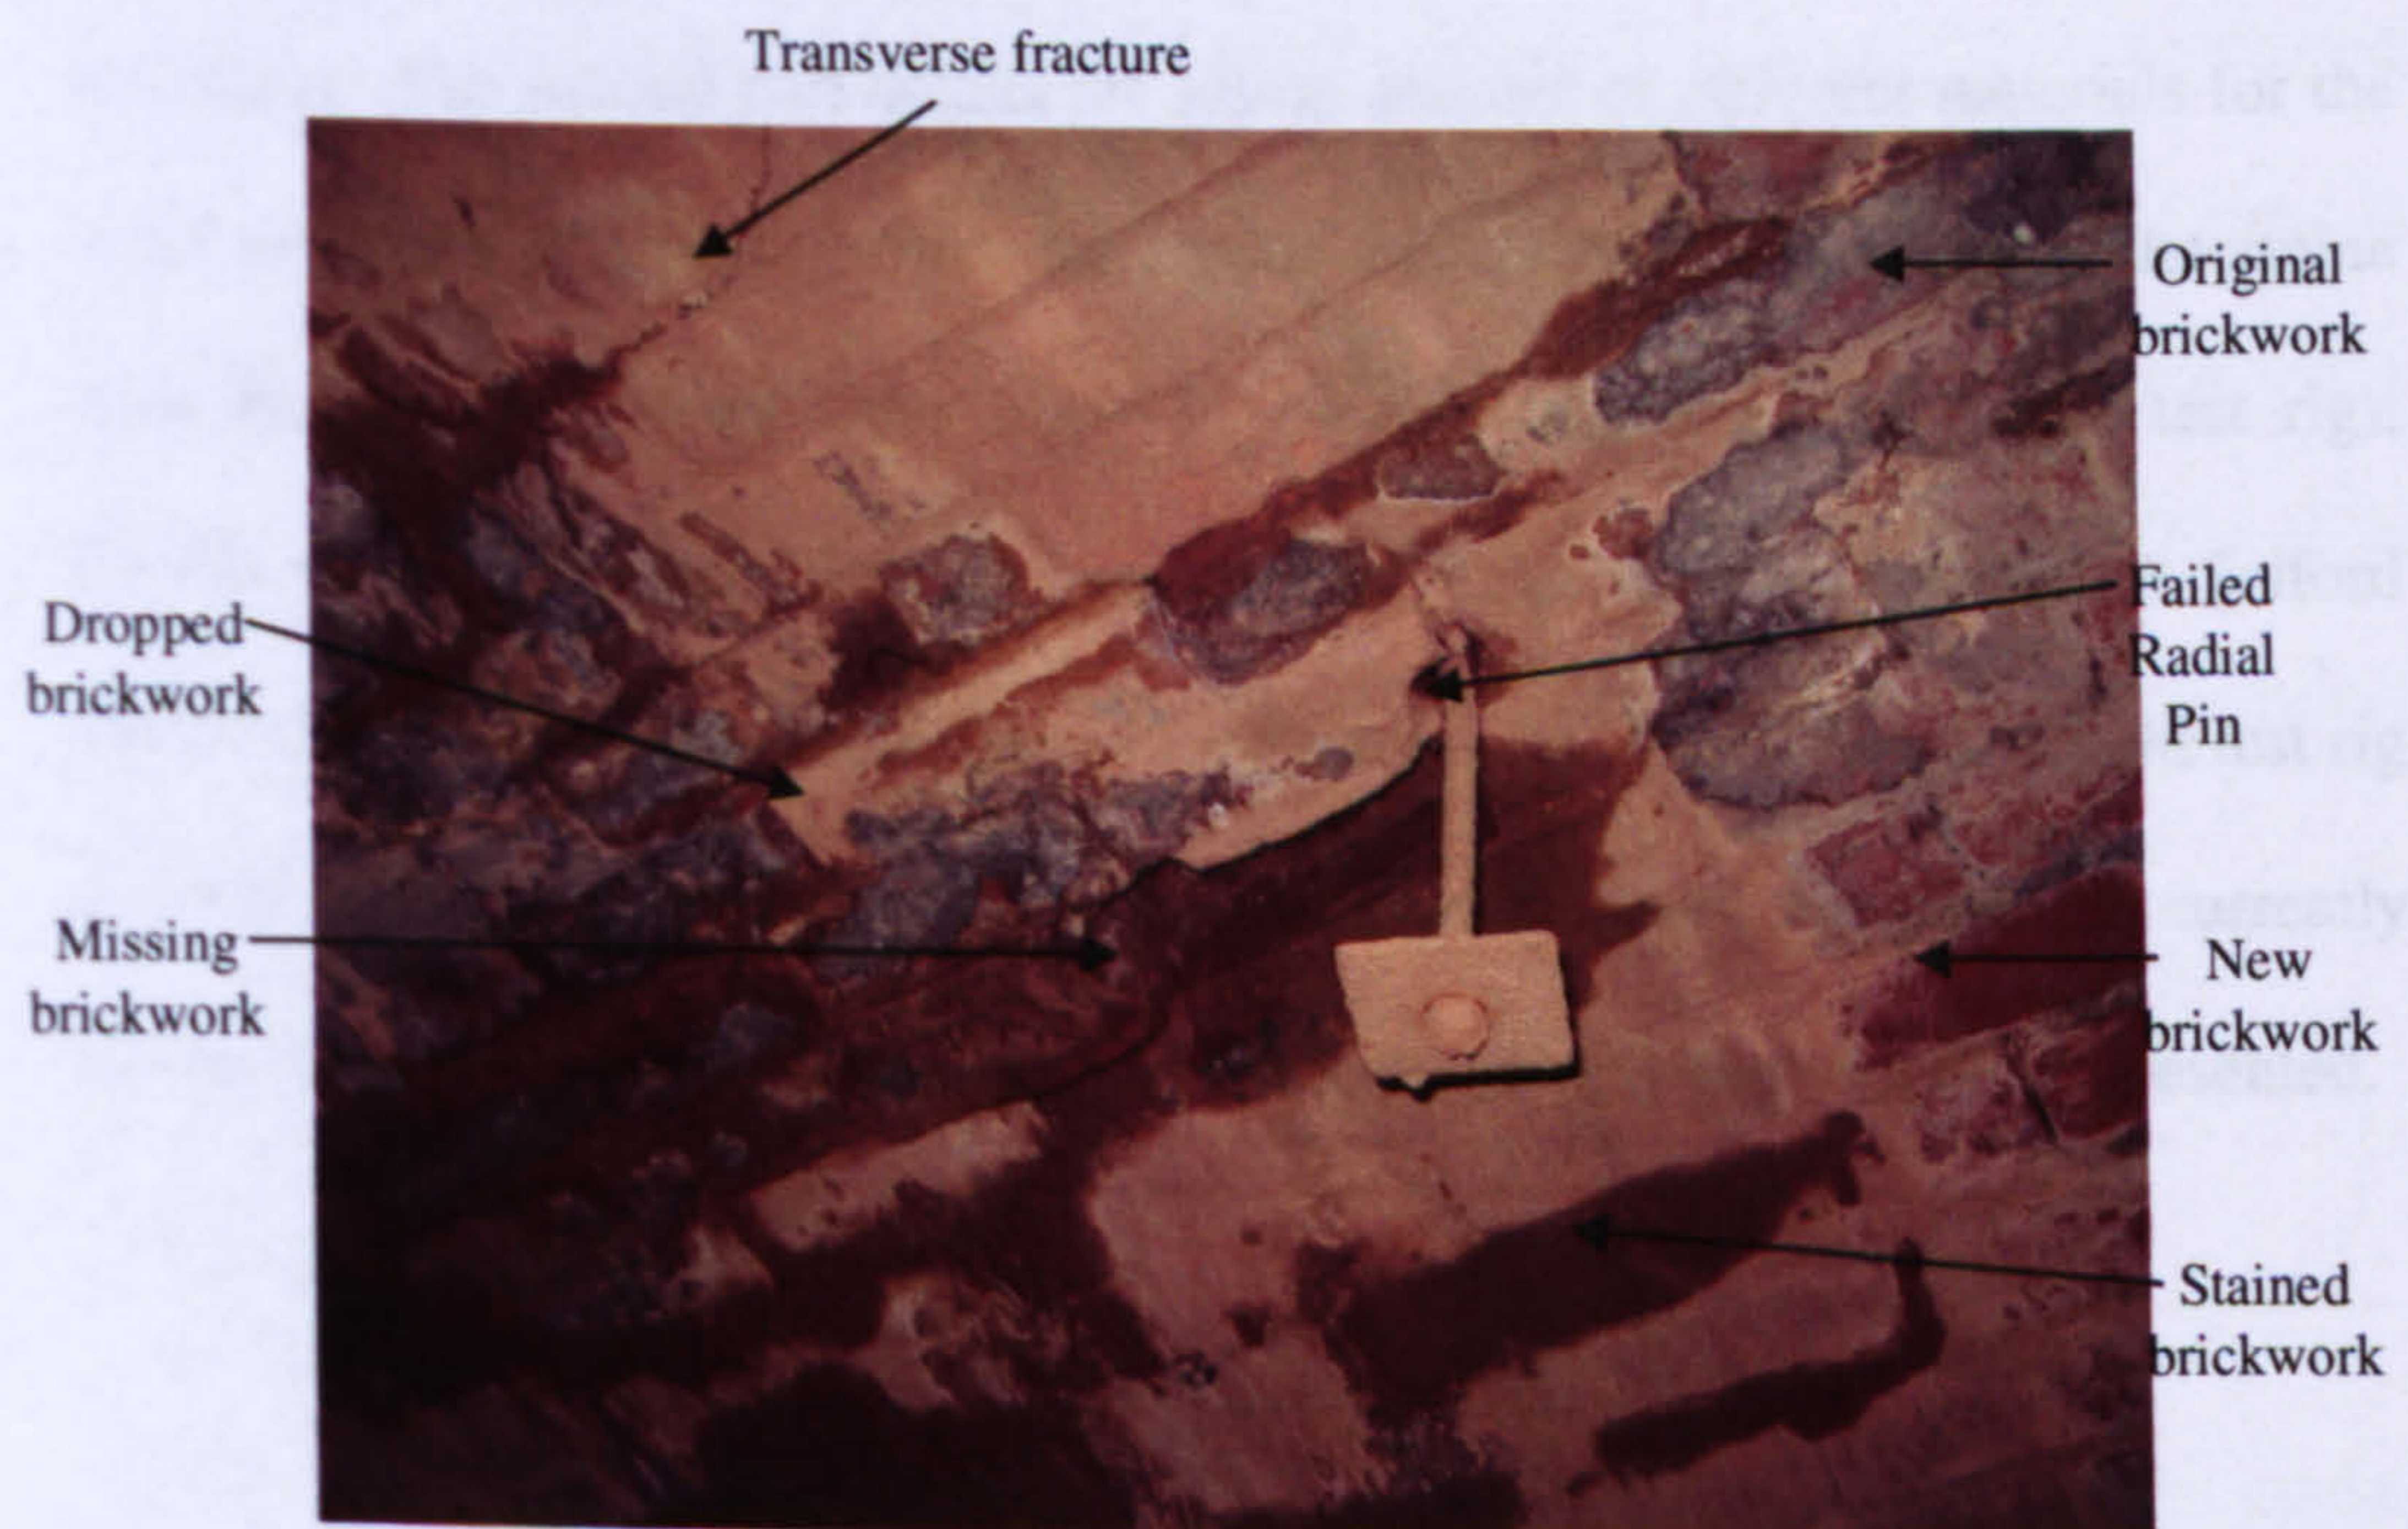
Inappropriate choice and poor installation of repairs on an arch bridge
